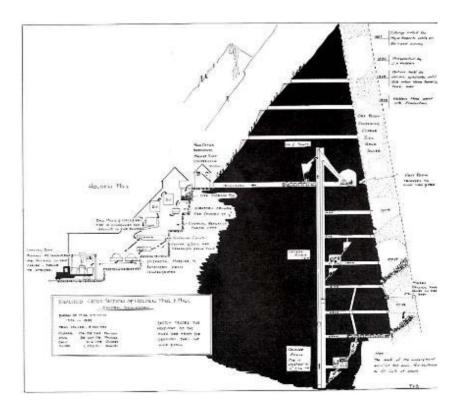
View of the Underground Tunnel Explorations at Copper Mountain.
